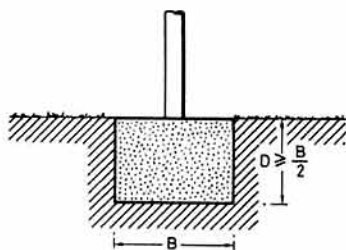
Unless reinforcement is used in a concrete base, the ratio of height:width should be 1:2 or greater
